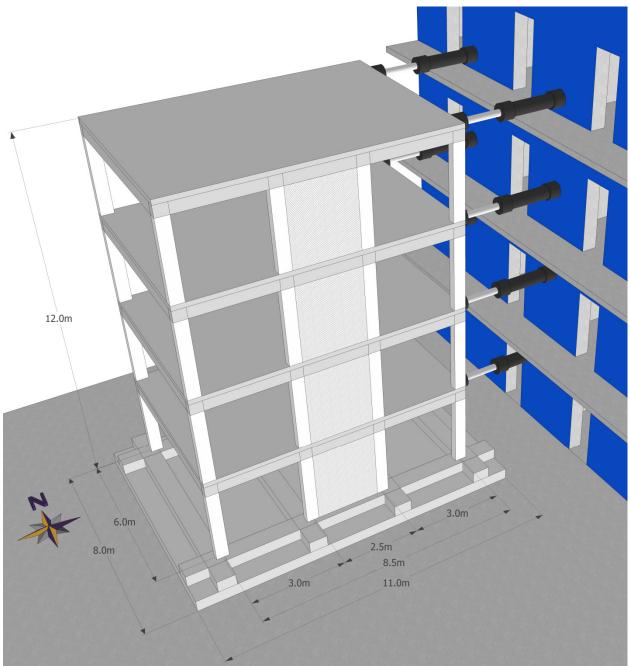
View of the SERFIN specimen with infill walls with an indication of the cardinal directions. The south frame with infill walls is visible in front.
